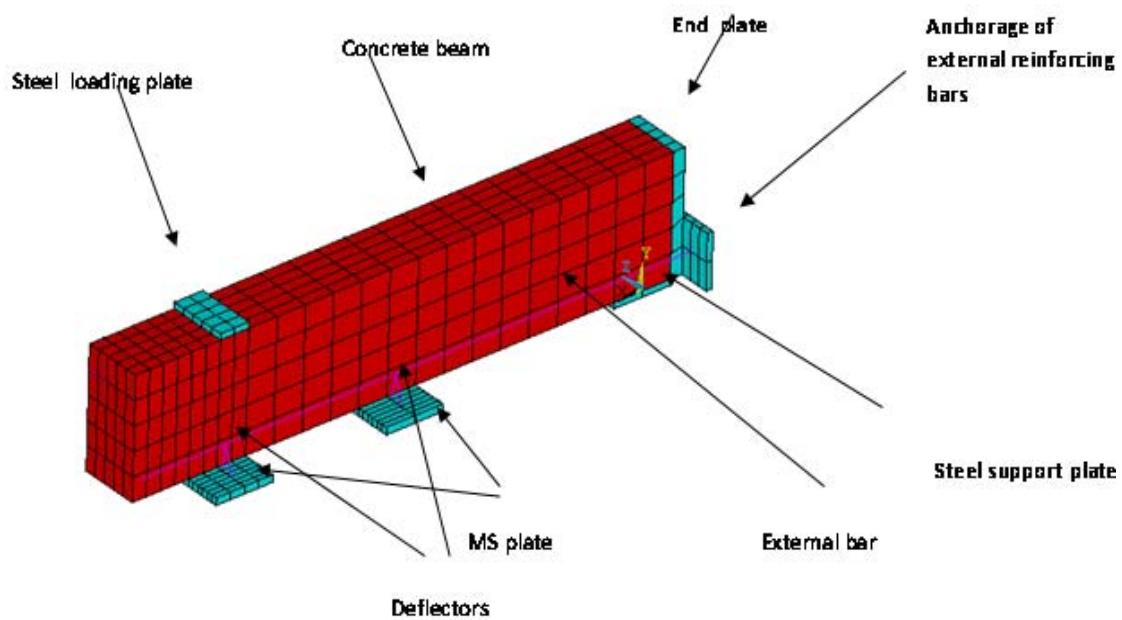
Constituent elements of strengthened reinforced concrete beam in ANSYS
